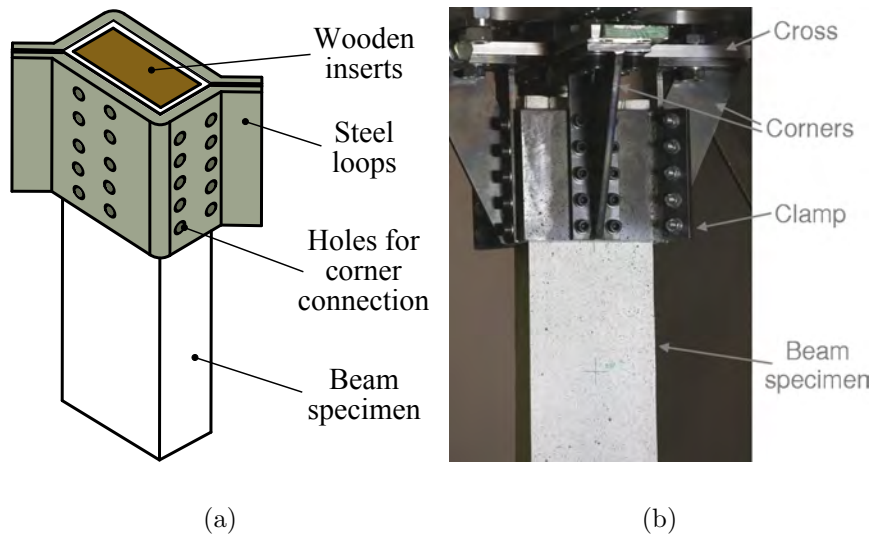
3D drawing (a) and a photo (b) of beam mounting at the piston extension.
